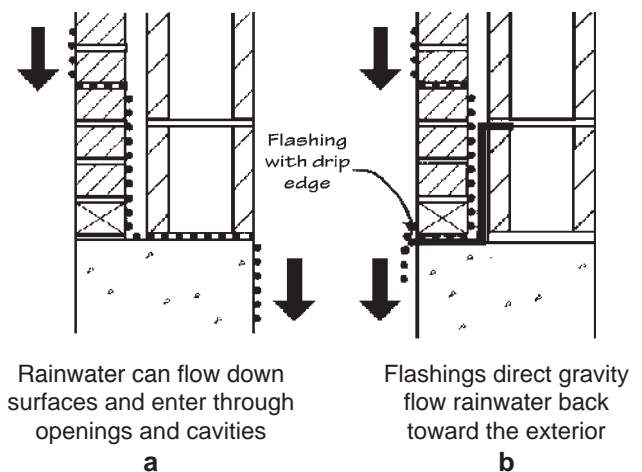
a and b. Rainwater flow down surfaces and flashing with drip edge. Two additional flashing details also ensure drainage to the outside away from wall.
